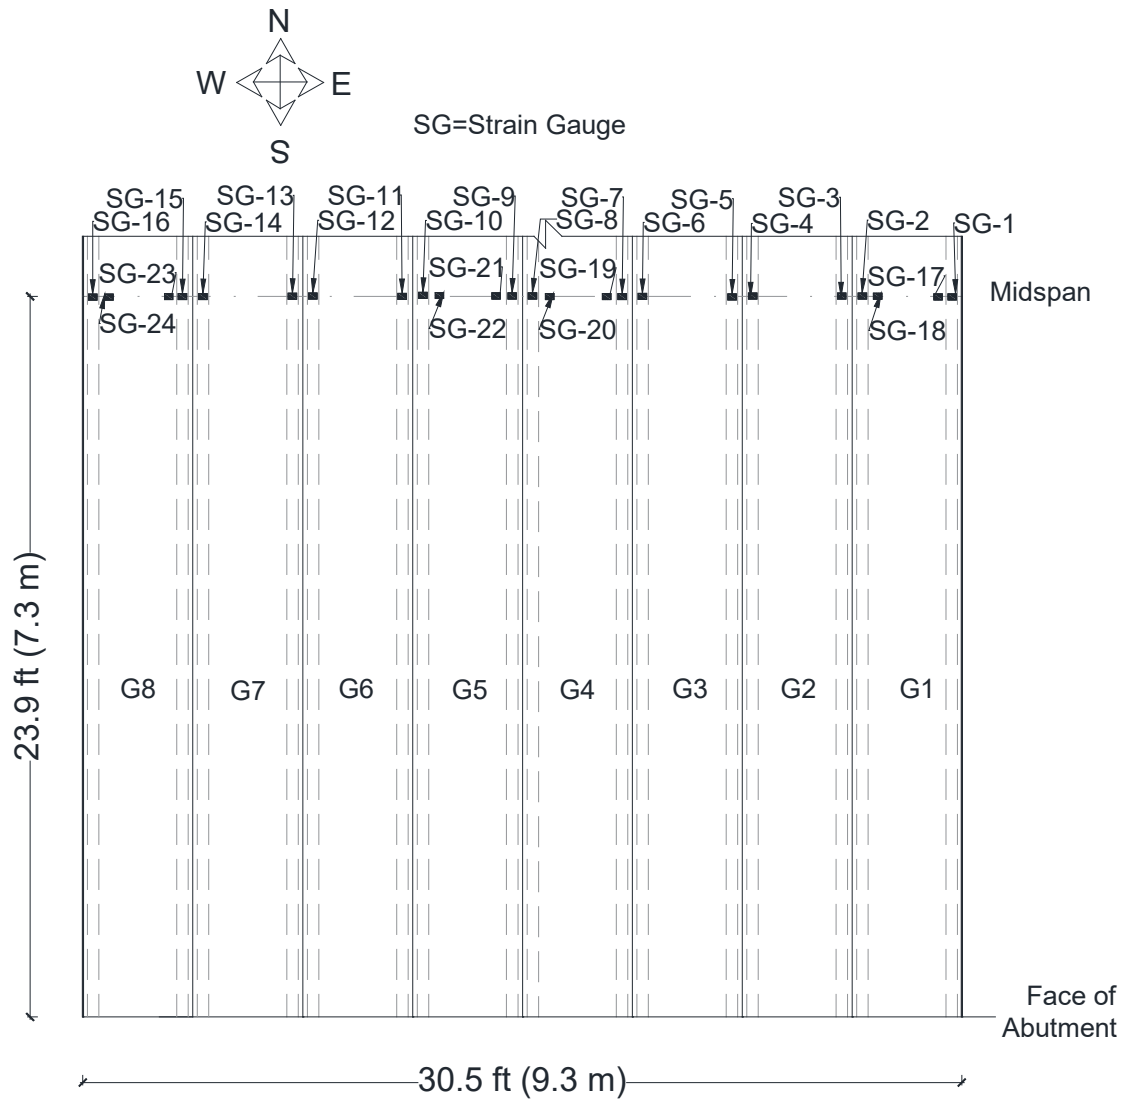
Strain Gauge Instrumentation Plan for Flexural Response of 23-in. (584-mm) Deep Double-Tee Girder Bridge – Plan View
